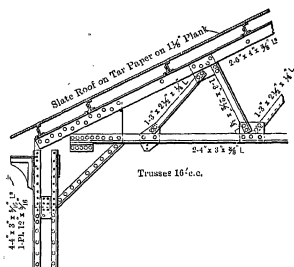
Template Shop Roof-truss, Ambridge Plant of the American Bridge Company.
